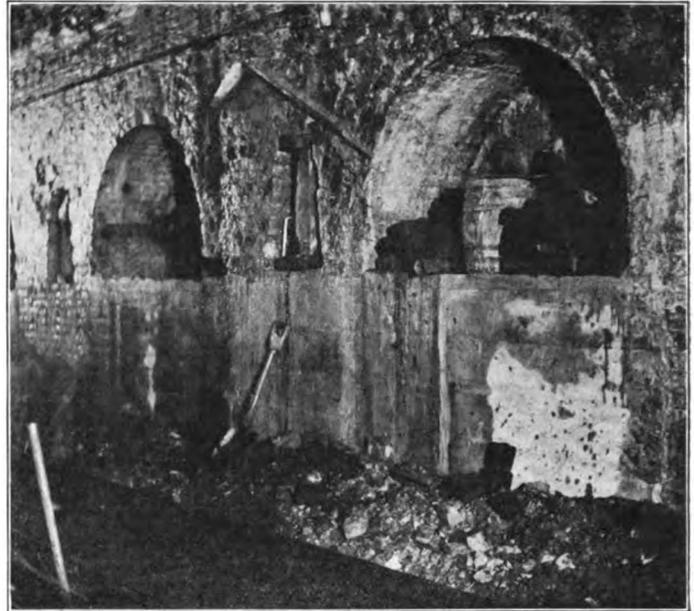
CENTER OF NORTH WALL OF WASHINGTON STREET TUNNEL. the Clinton St. side 1 in 14.7. There will be about 190 ft. of roof to be lowered, and about 190 ft. of track together with 1,000 ft. in the approaches.
